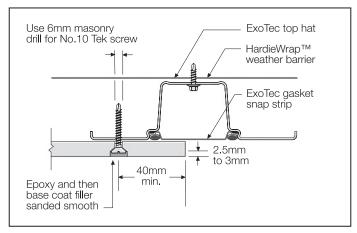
COUNTERSUNK FASTENER DETAIL
